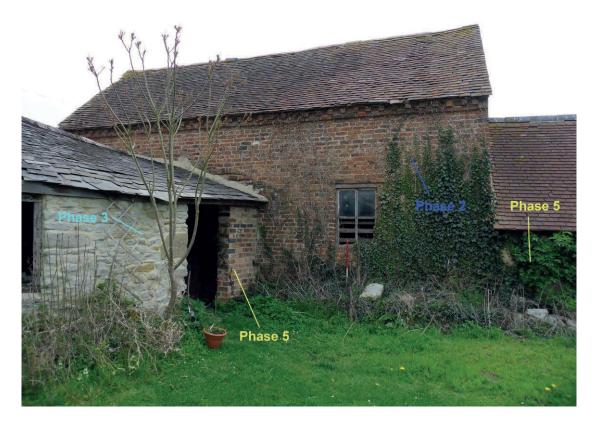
View looking SE showing NW facing elevation of Barn A with dentilled cornice at eaves level and attached horse engine house
